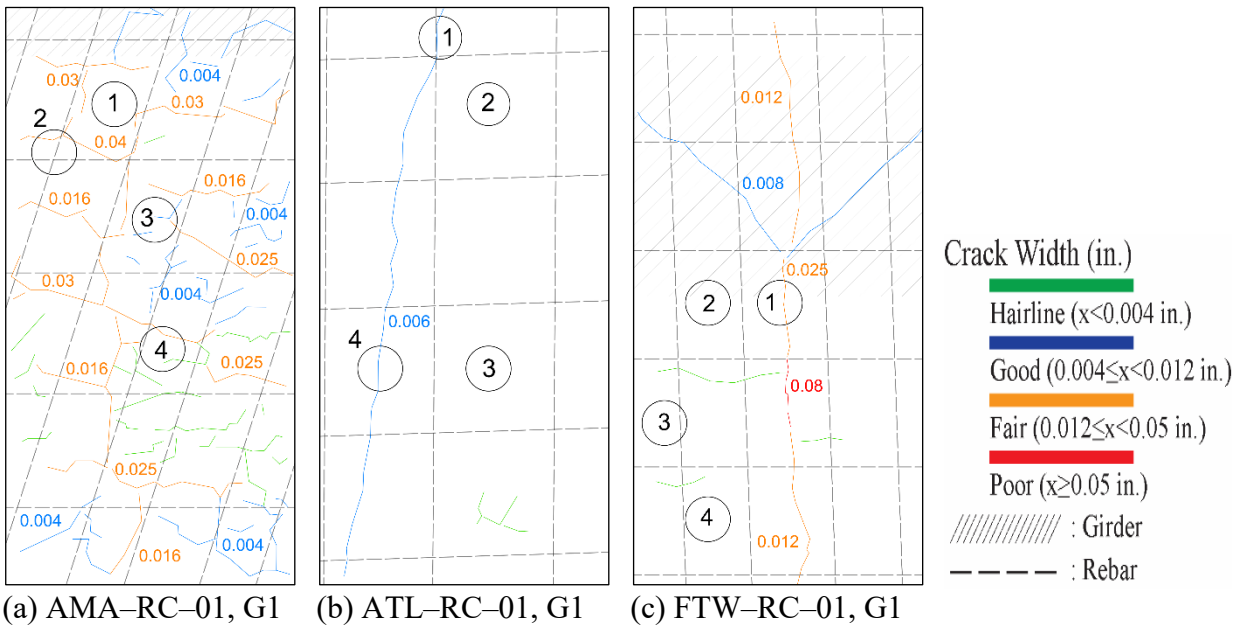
Locations of Obtained Cores, Cracks, Rebar, and Girder in Grids.
